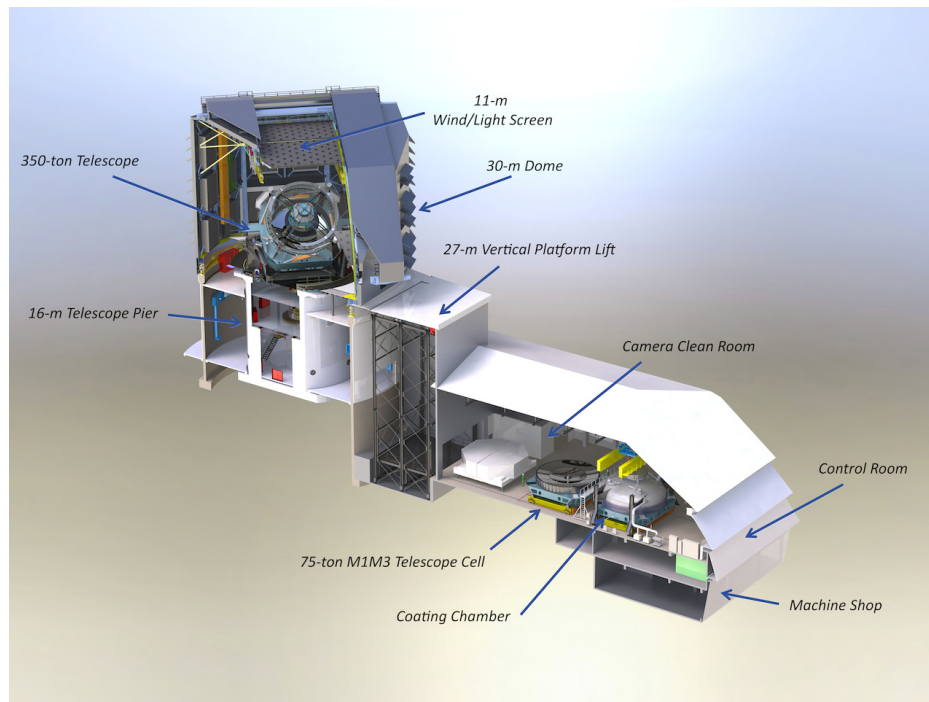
Artistic conception of LSST facility. Picture adapted from the LSST telescope and site information website [58].
